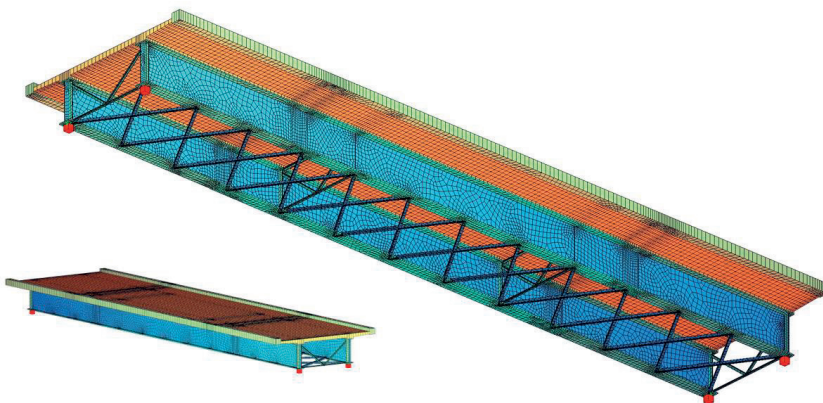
FE-model showing the horizontal truss with the shape: X-truss
